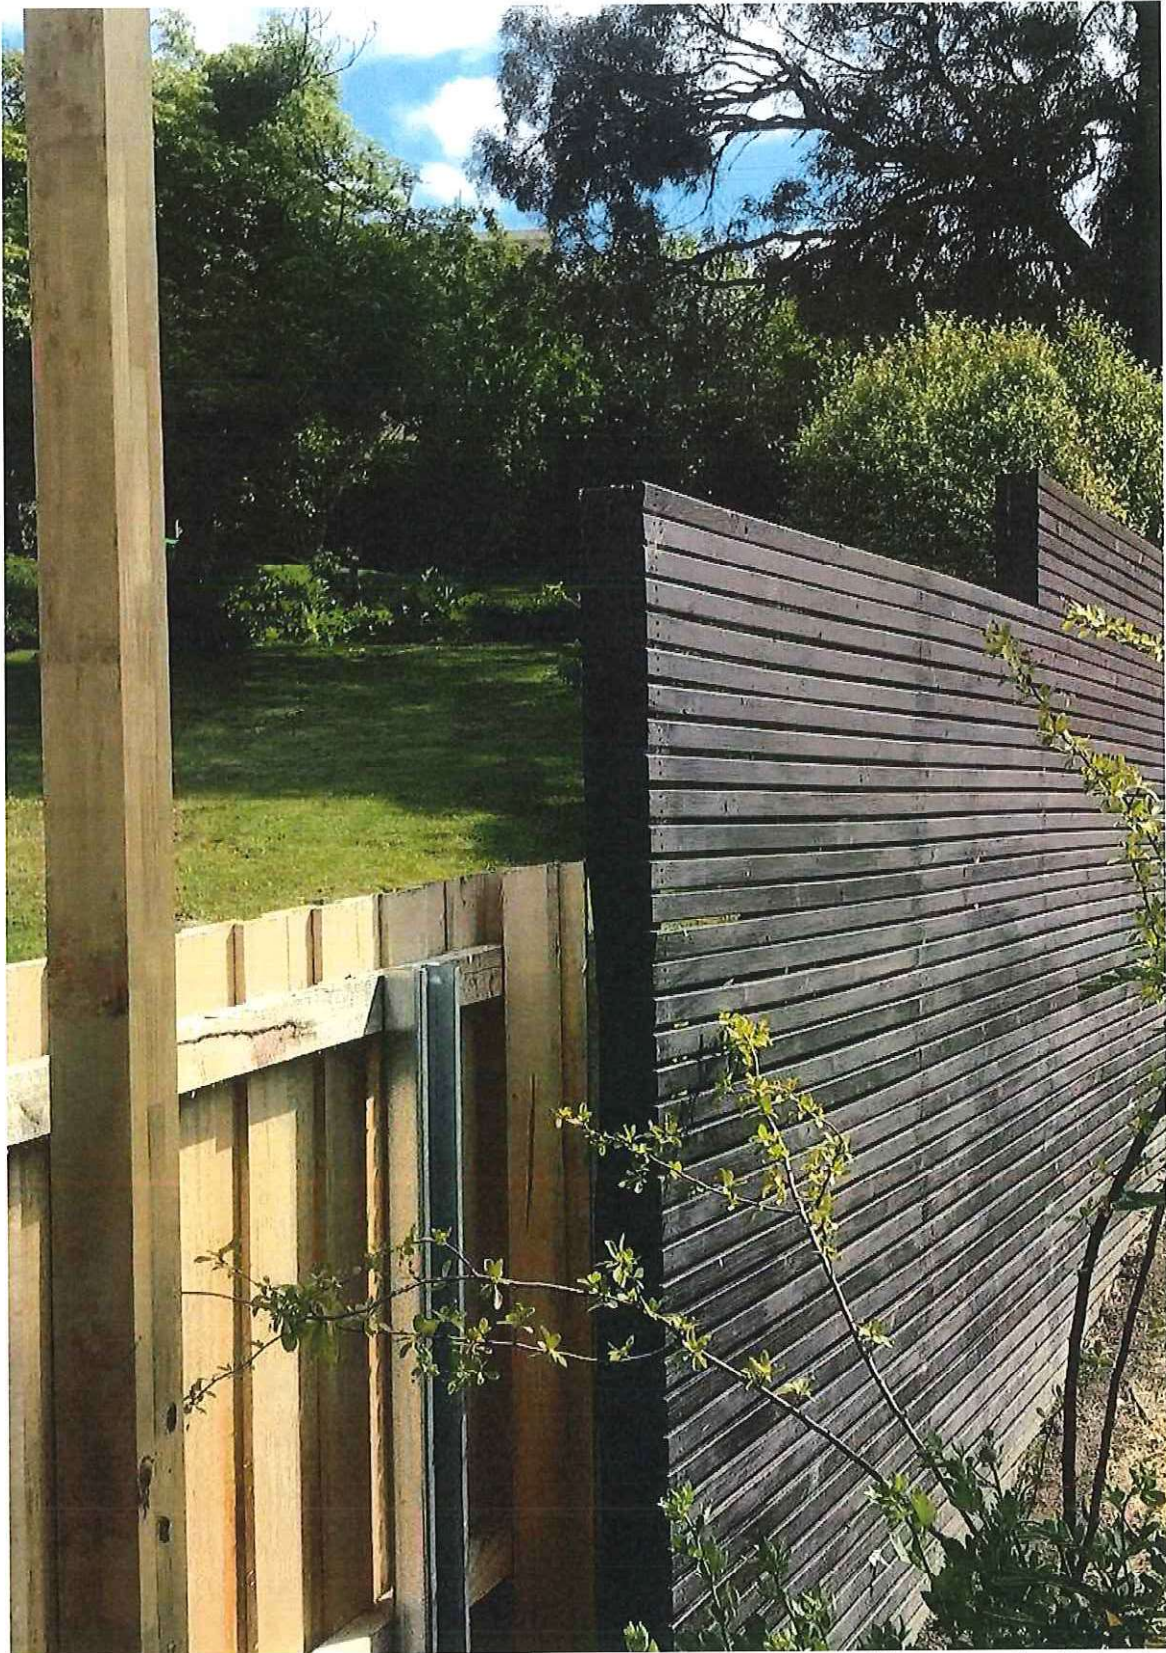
View of building site-note site is elevated compared to neighbouring properties. (Photo perspective Fig 1 : A to B)
